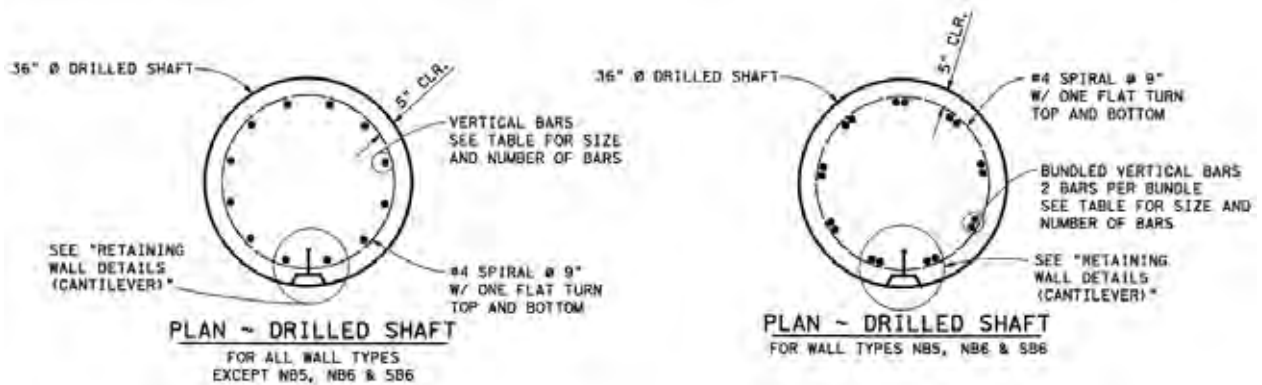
Reinforcement types for cantilever drilled shaft wall.
